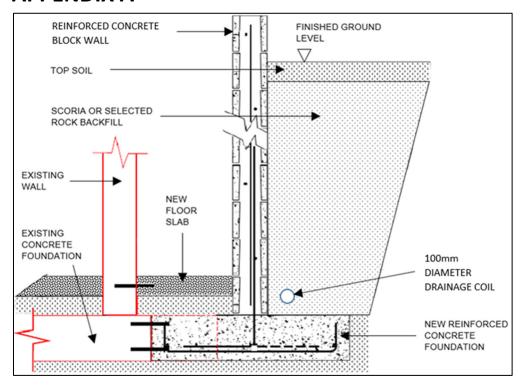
Extract from plan "Block Wall Design" S-01 (not to scale)
